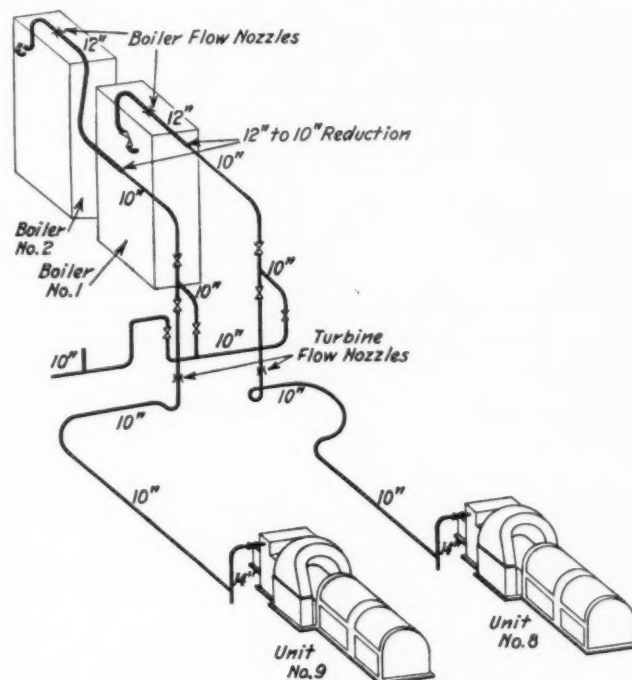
ISOMETRIC SKETCH SHOWING LOCATIONS OF FLOW NOZZLES IN 600-LB 825-F STEAM PIPING OF CONNERS CREEK PLANT
